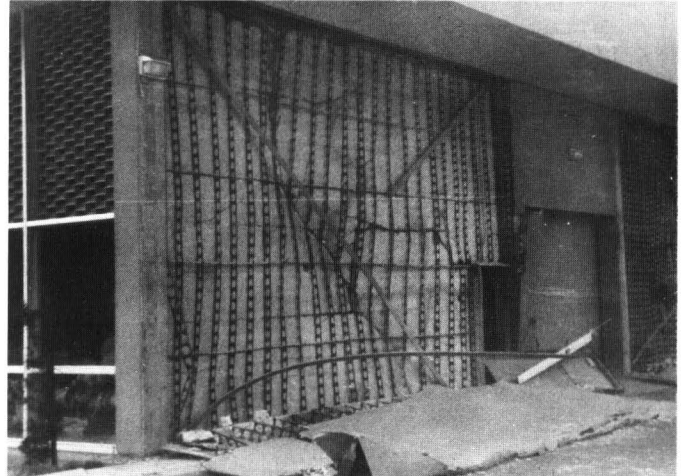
Olive View Power Building. Flat-bar bracing broken in north wall.
